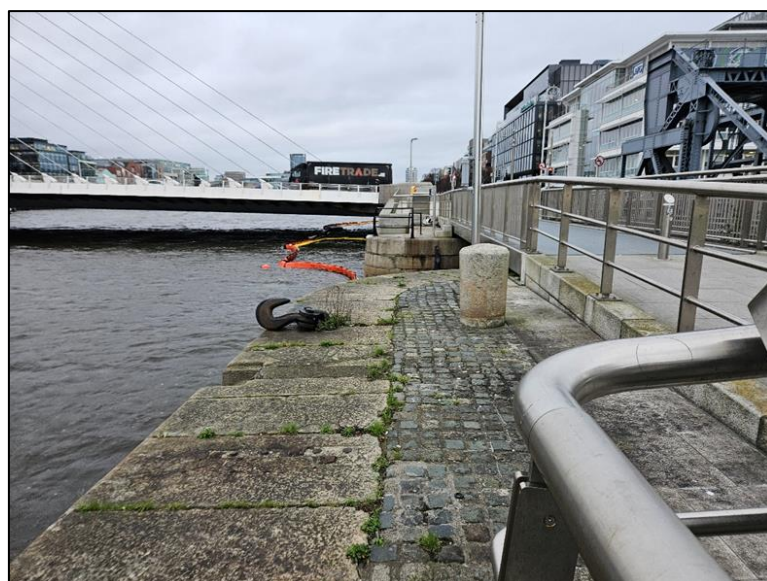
Existing Jeanie Johnston pontoons at Area B [J.McC 29/01/2026]
